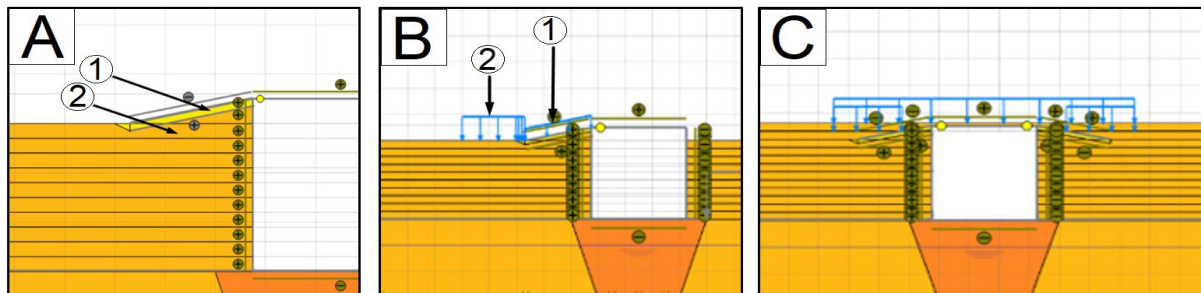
Principles of construction the transition slab: Figure A) shows that a 20 cm corrective layer is built under the entire slab, B) shows how it is being compacted by the weight of the slab and C) overfilled and ccompaction with light equipment
